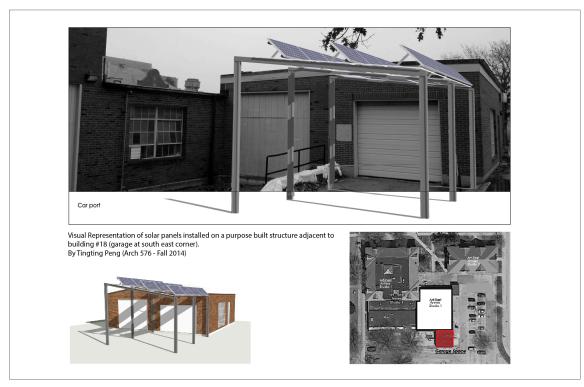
(Option 2b) Solar Panels to be repurposed on purpose built structure adjacent to building #18 to power FAA – IT electrical vehicles.
